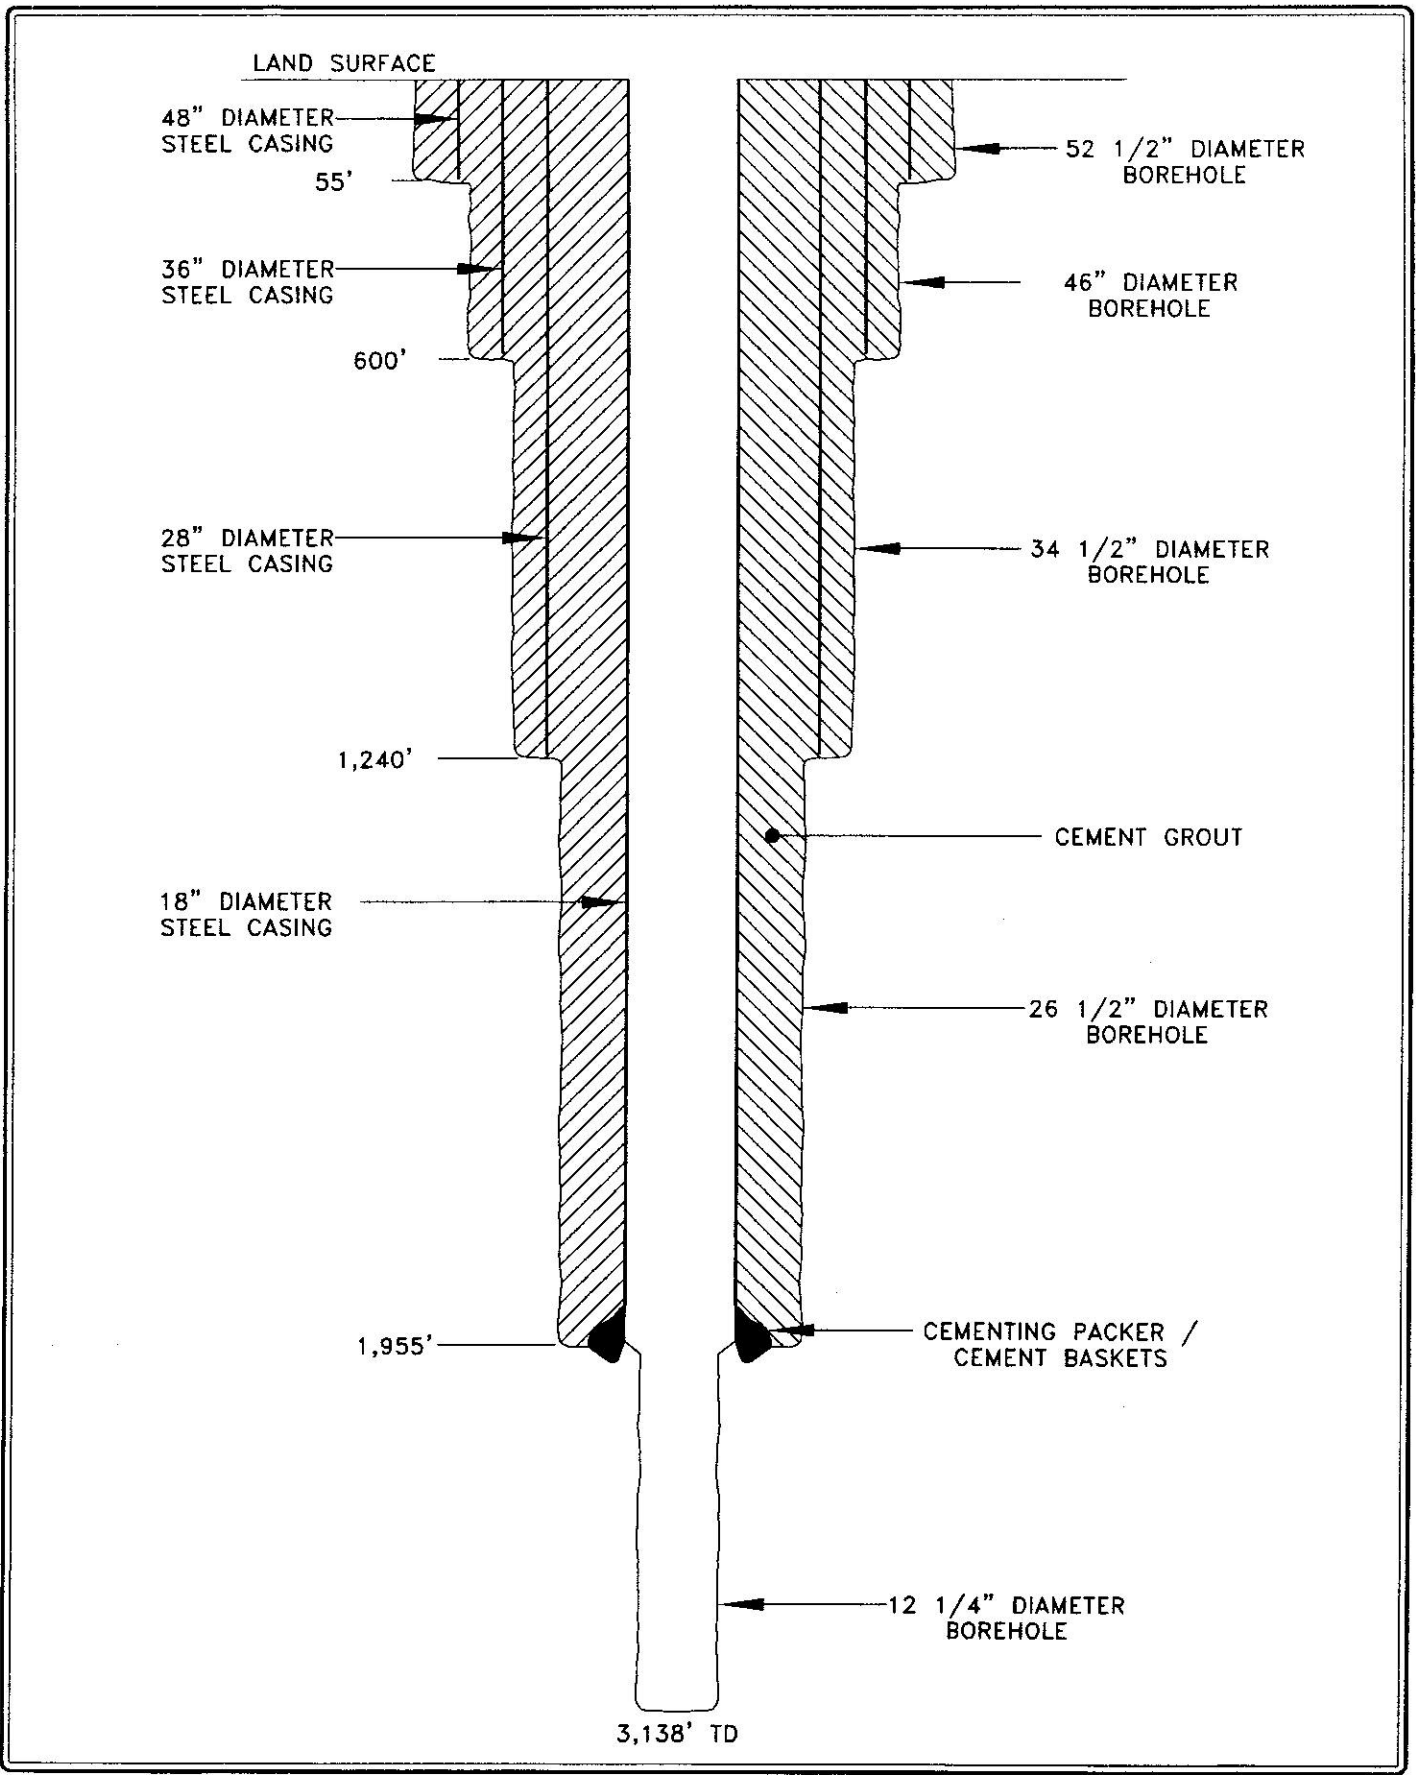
SCHEMATIC DIAGRAM SHOWING INJECTION WELL (LM-7973) CONSTRUCTION DETAILS.
